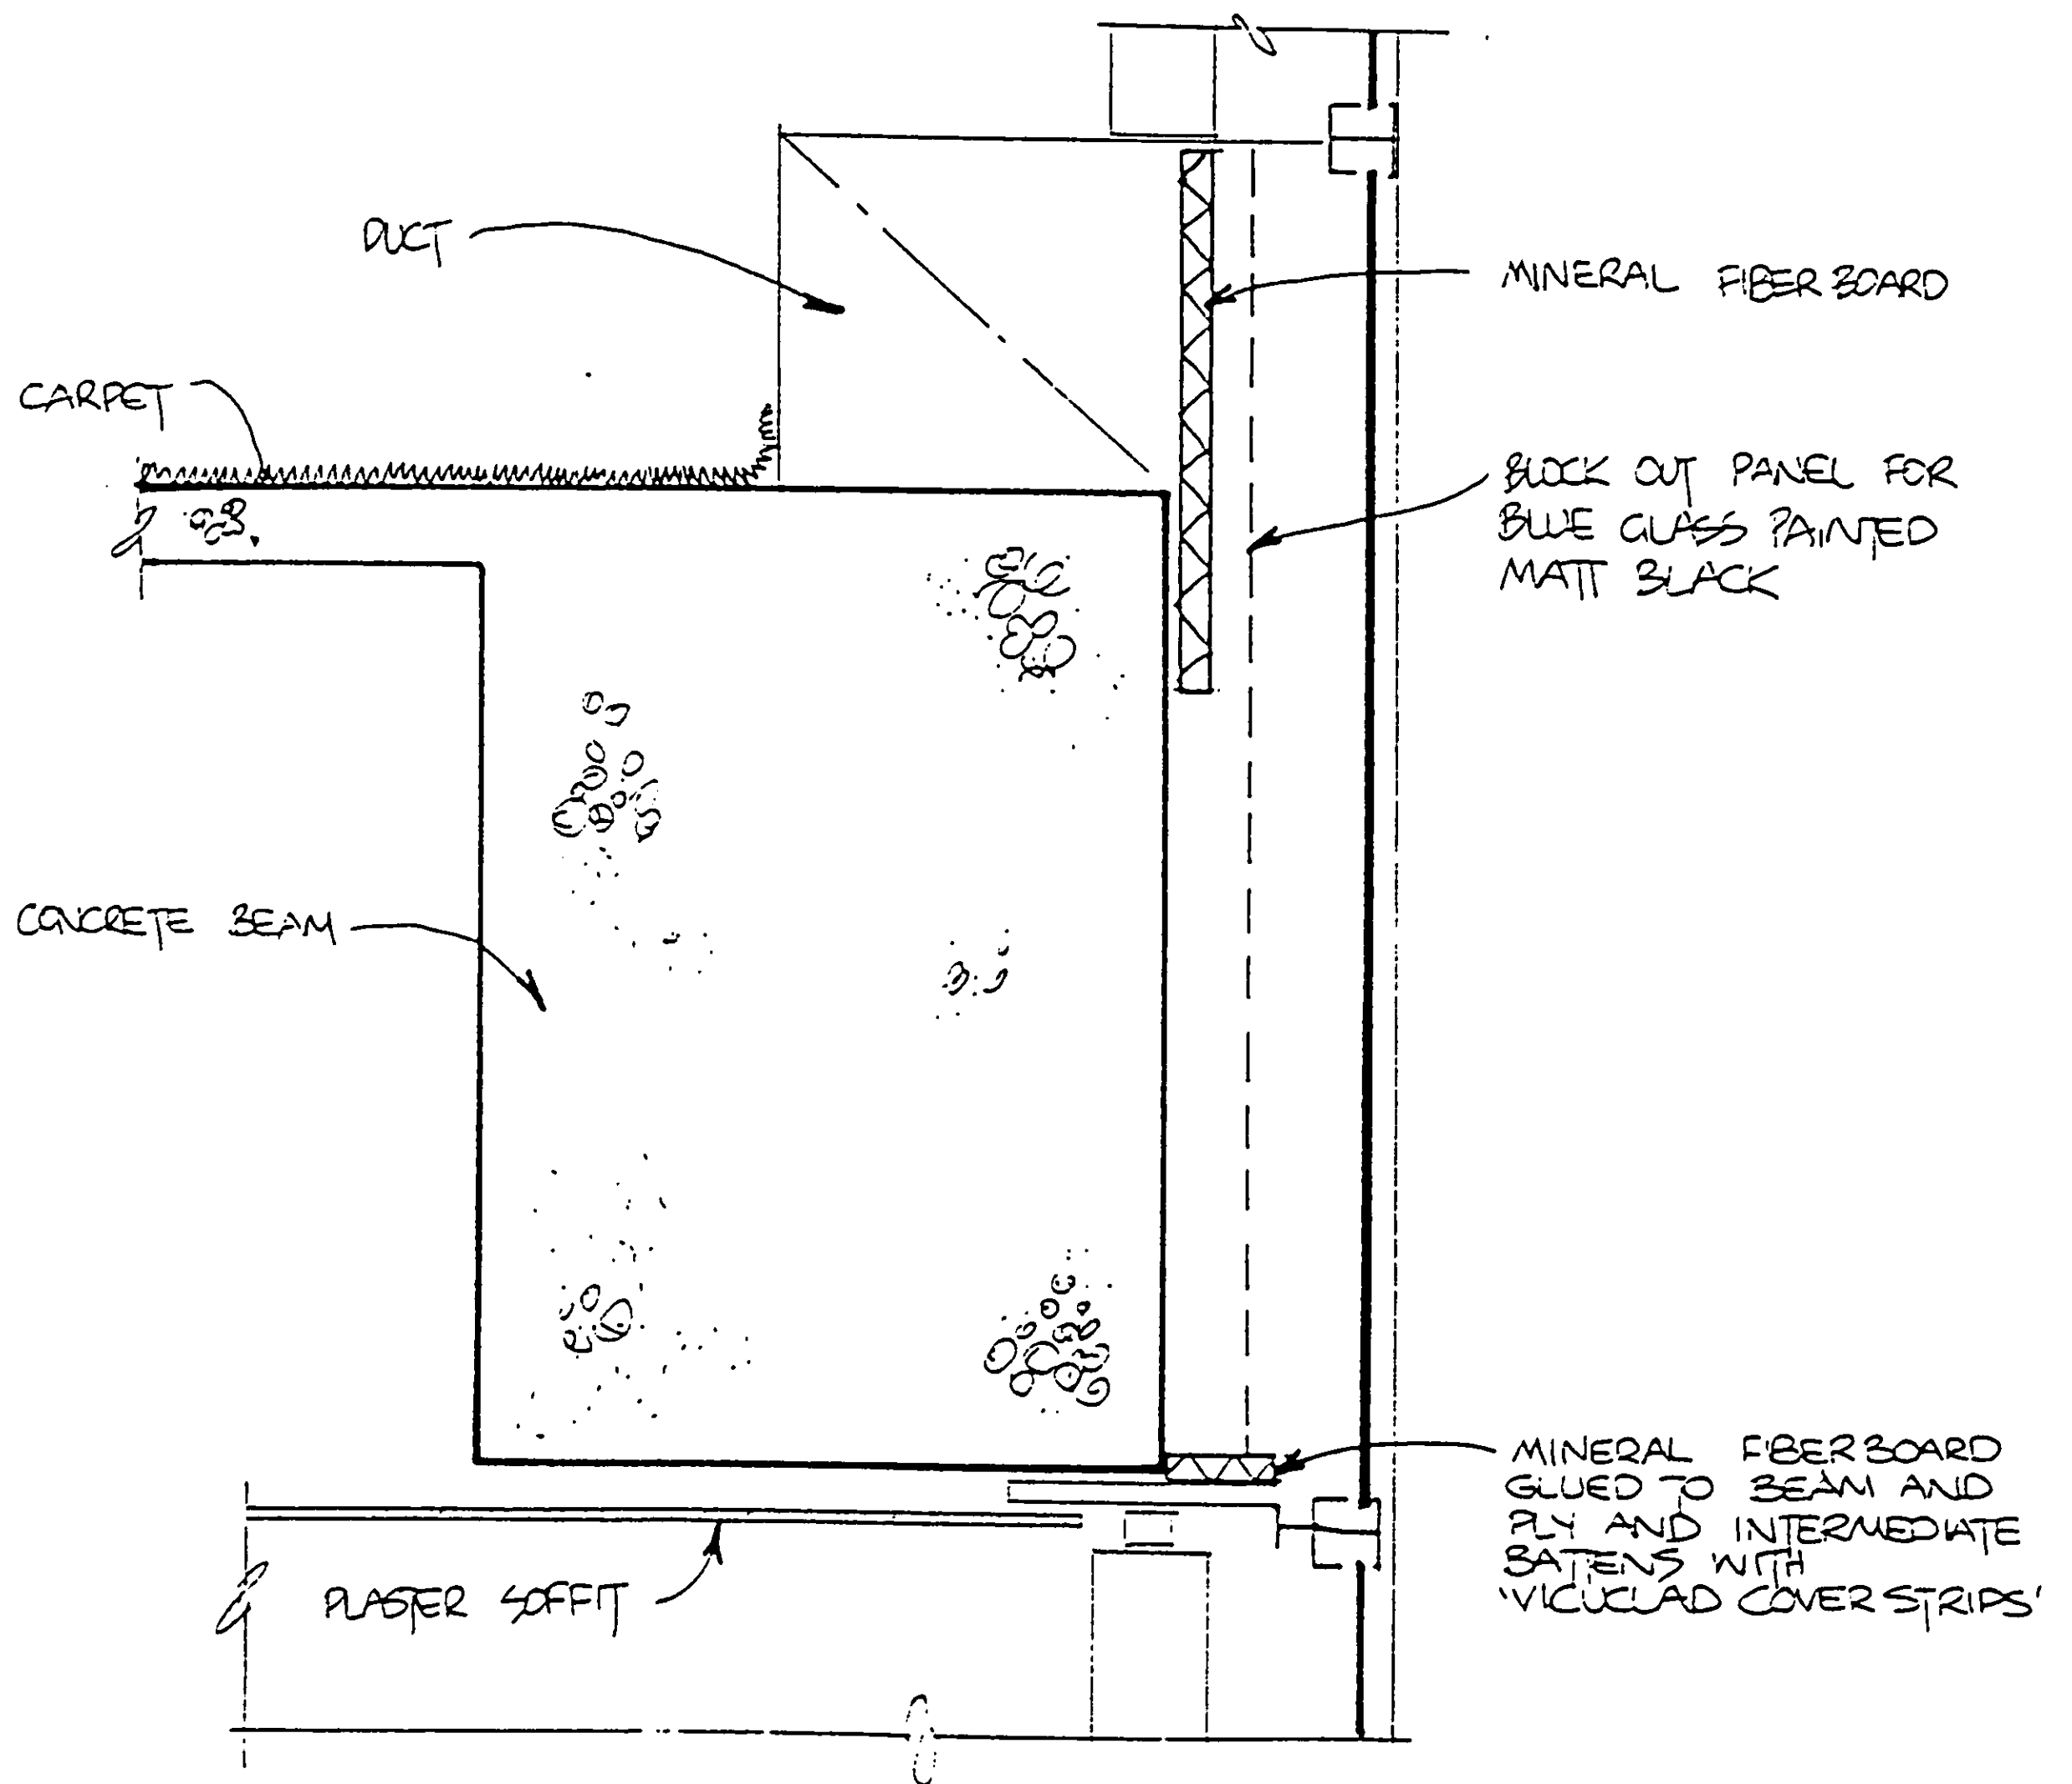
(G): SECTION THROUGH CONCRETE FRAMED, GLASS CURTAIN WALL BUILDING
